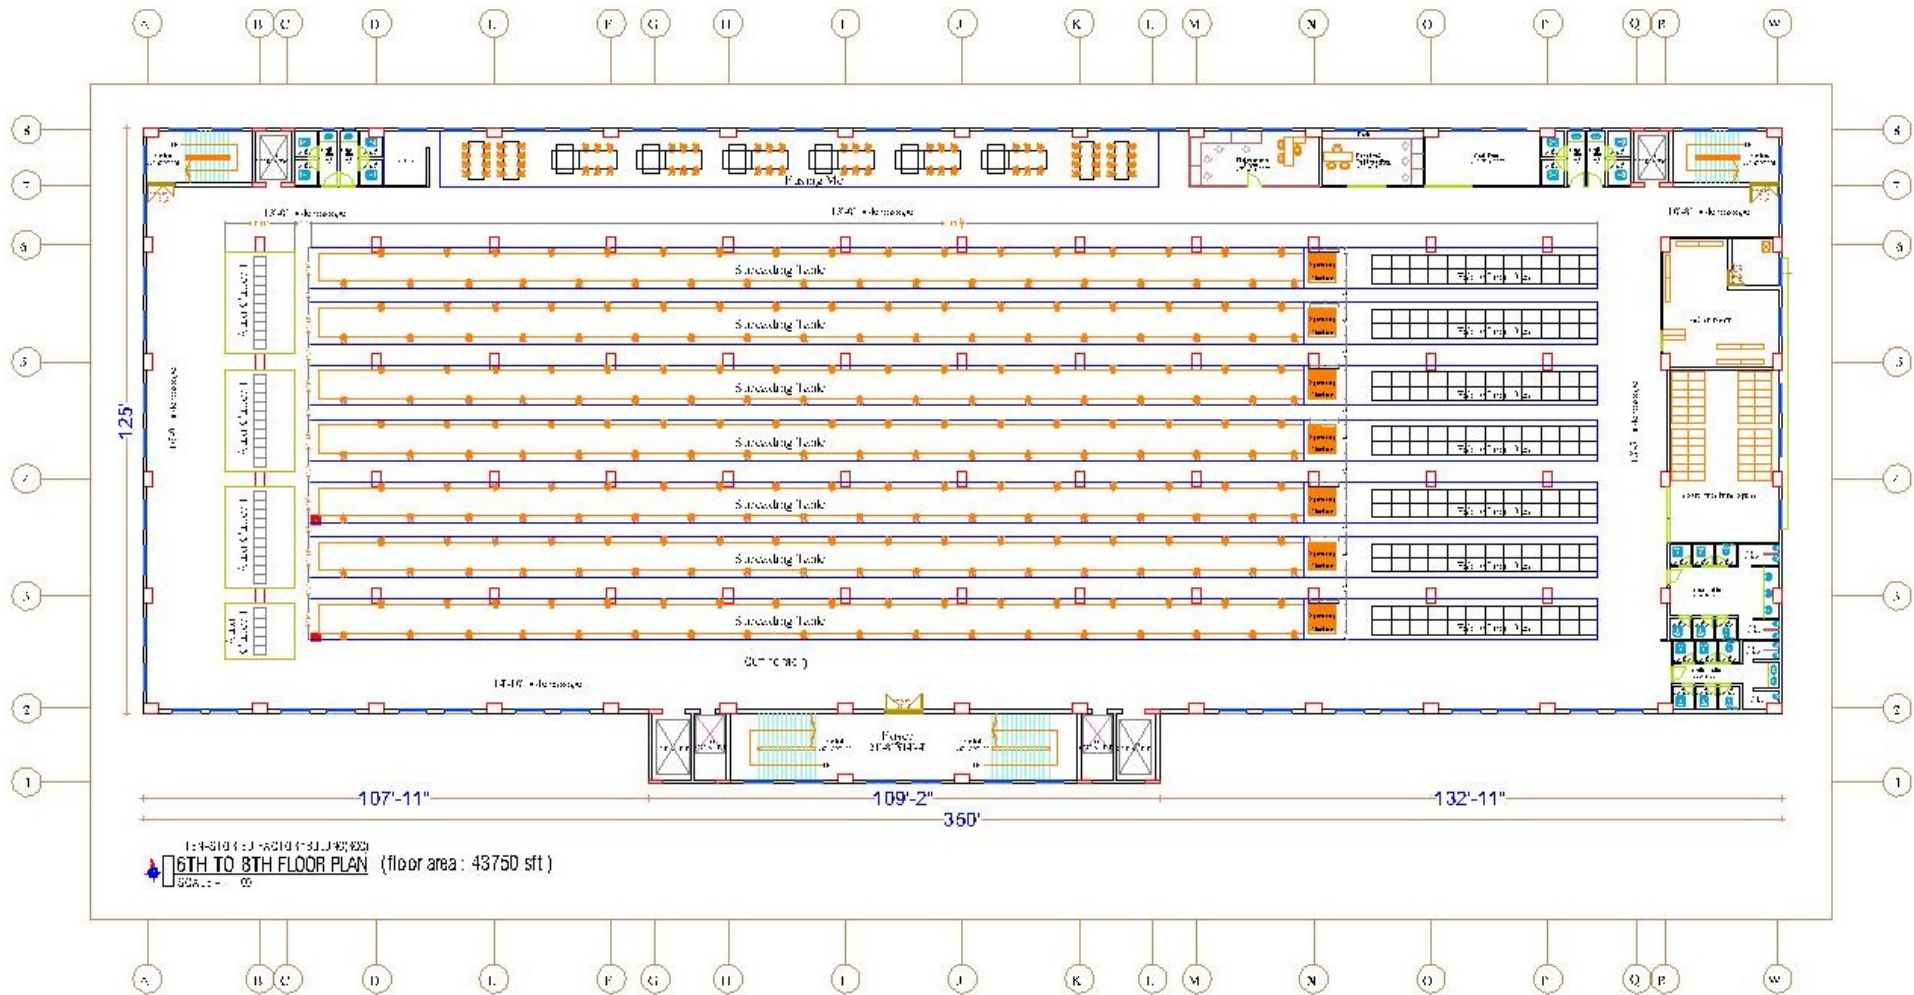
A typical plan view of 6th floor to 8th Floor
